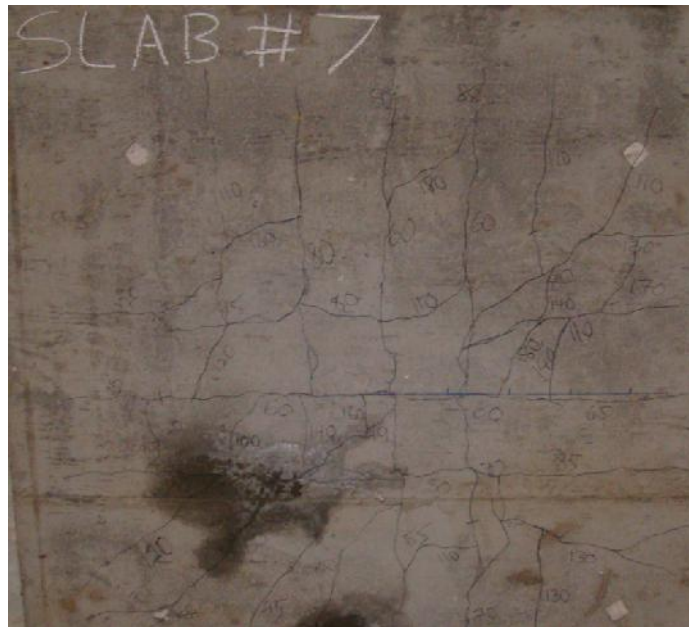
Crack patterns of the test slab HFR250-0.68/0.2
